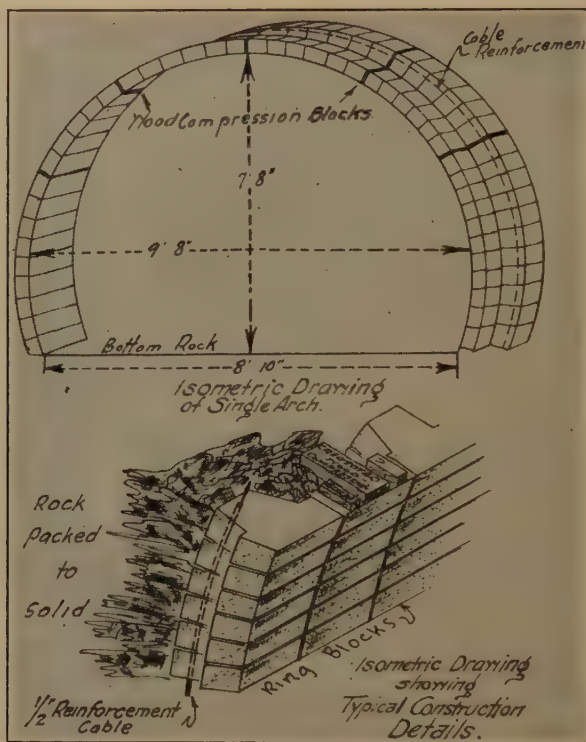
ISOMETRIC DRAWINGS OF SCHAEFER LINING.
